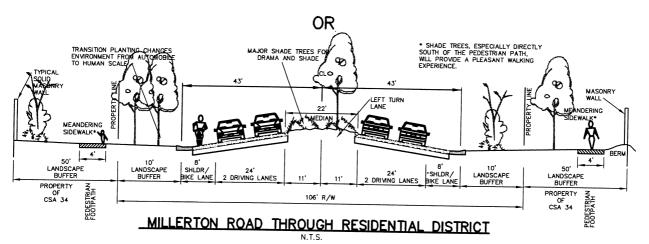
ROAD STANDARDS FOR MILLERTON ROAD
